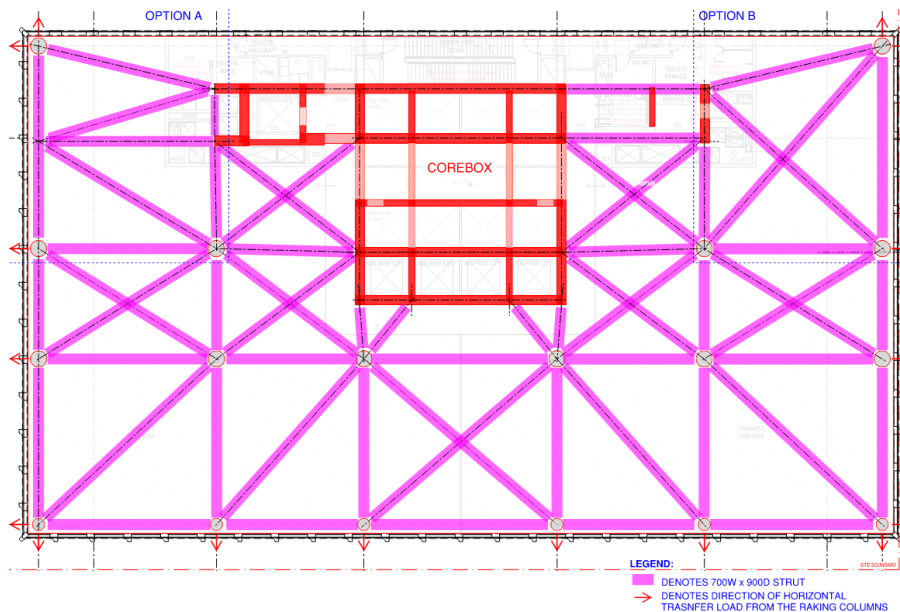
Plan View of the Level 14 Diaphragm Structure
